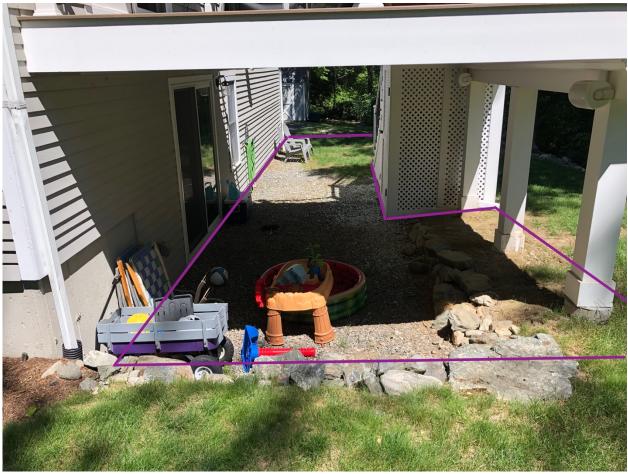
The proposed patio extends beneath an existing deck. Beneath the deck there is a gravel walkway and a retaining wall that will be shifted back a foot or two during the patio construction.
